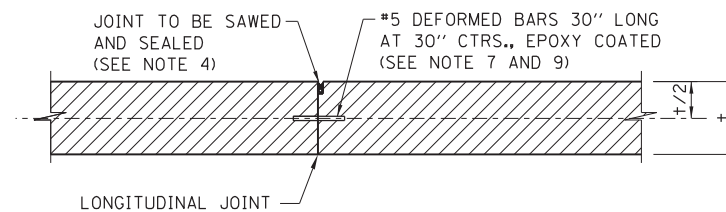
DETAIL B (LONGITUDINAL JOINT) (FOR PATCHES 20' OR LESS IN LENGTH)
